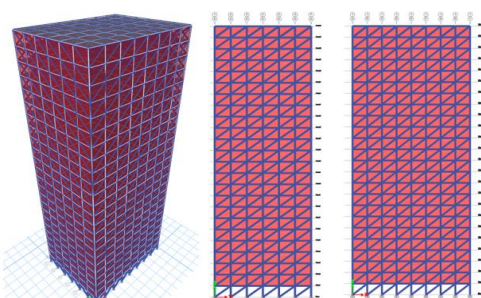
3D view MODEL-III Fig. 1.3b Masonry Infill Walls
